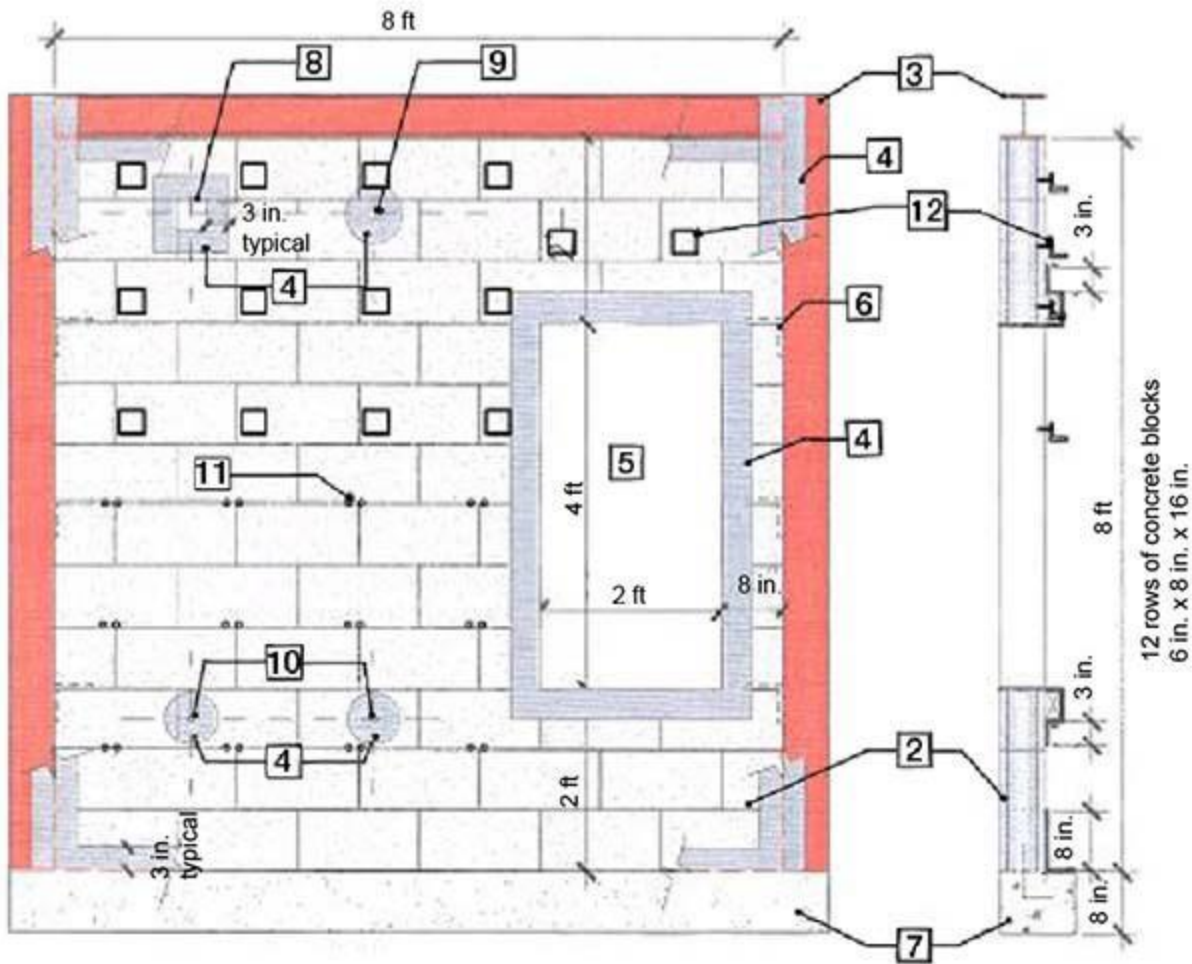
Specimen No. 2: Example of continuity across junctions and penetrations in masonry block infill wall with a steel frame and at foundation wall
